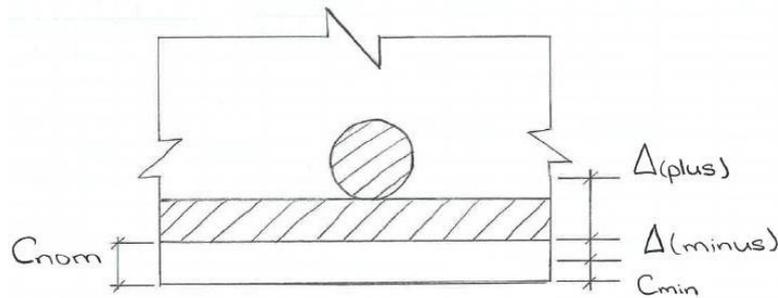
Cross-Sectional of Cover Dimension of Elements
